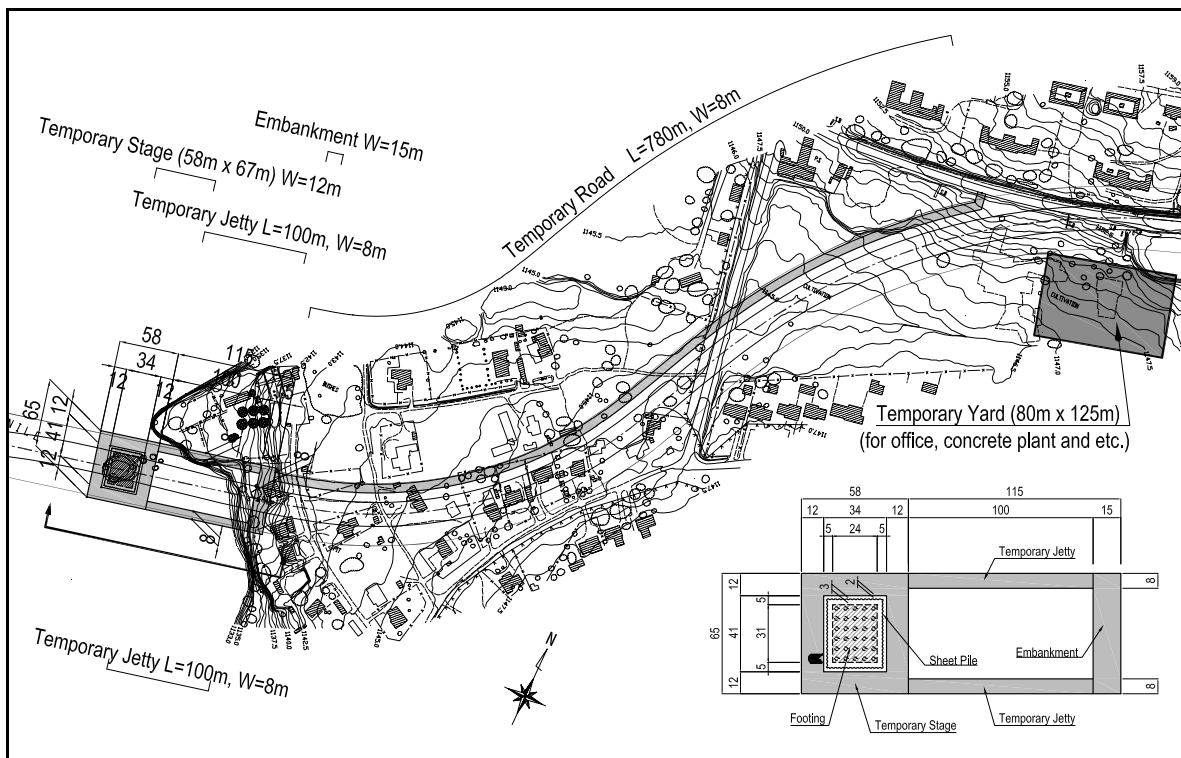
Location of Temporary Road and Yard at the Jinja side
